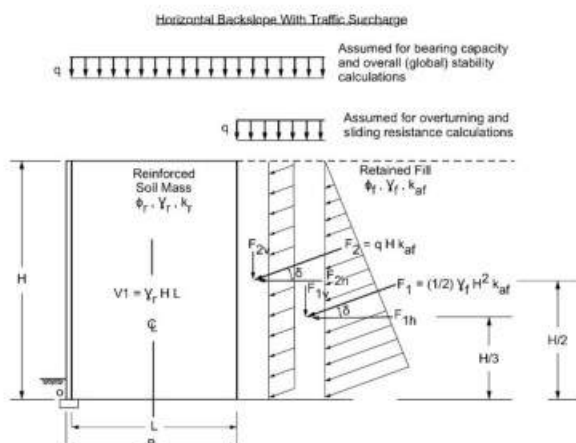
External Stability for Wall with Horizontal Backslope and Traffic Surcharge
